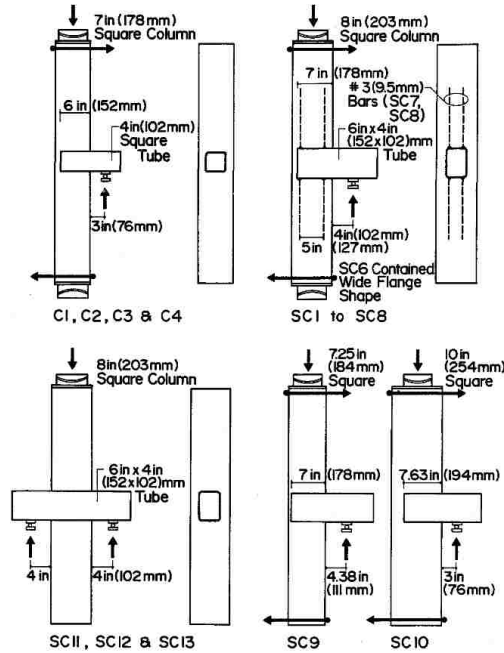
Detailing of Specimens Tested (Marcakis and Mitchell)
